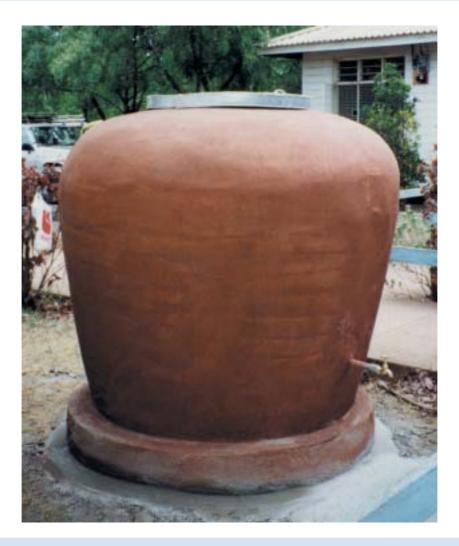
A 2,000-litre cement rainwater jar (rain water gutter and connecting pipe are yet to be fixed).
